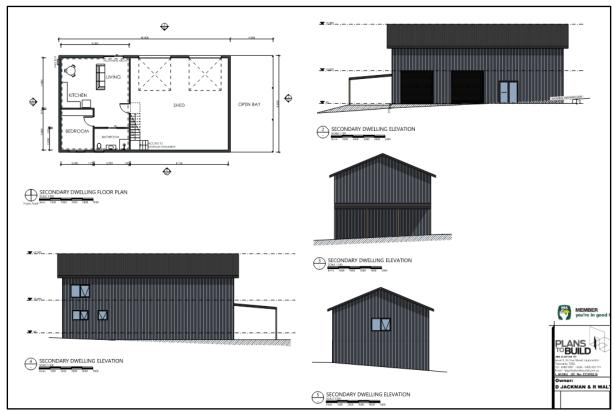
Proposal Plans - Secondary Dwelling/ Outbuilding Floor Plans & Elevations
